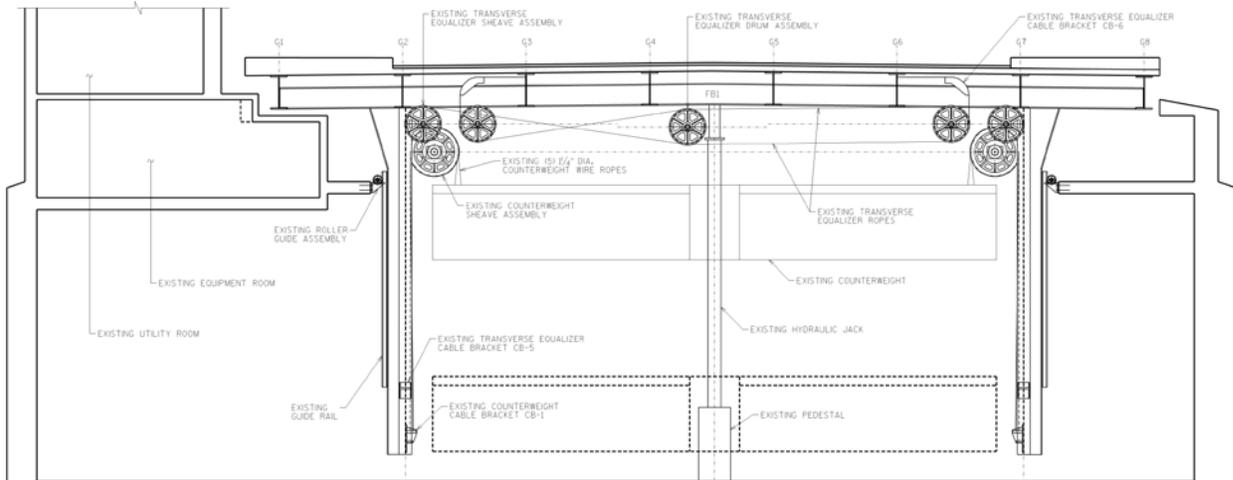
Elevation view of previous Wisconsin Avenue Bridge lifting and equalizing components. Note only single hydraulic piston used to lift superstructure.
